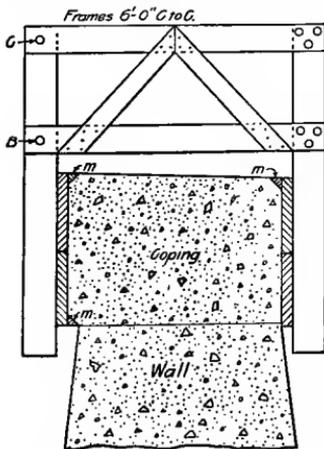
SECTIONAL FORM FOR COPING OF WALL.
